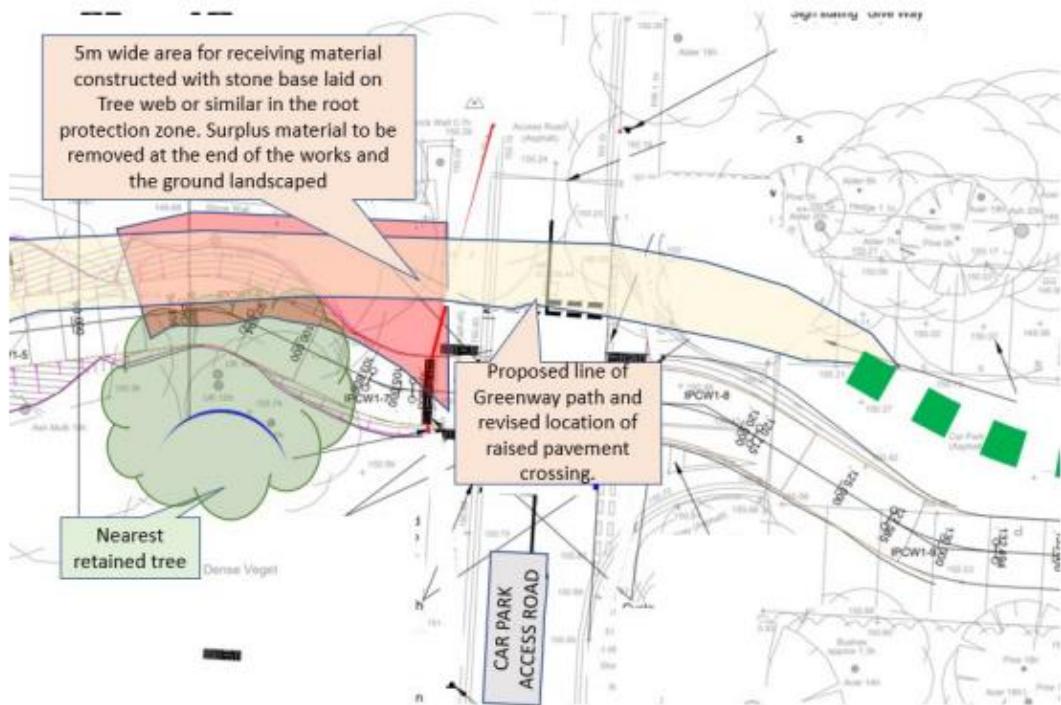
Plan showing works access from Cannard's Grave Road via carpark access road.
